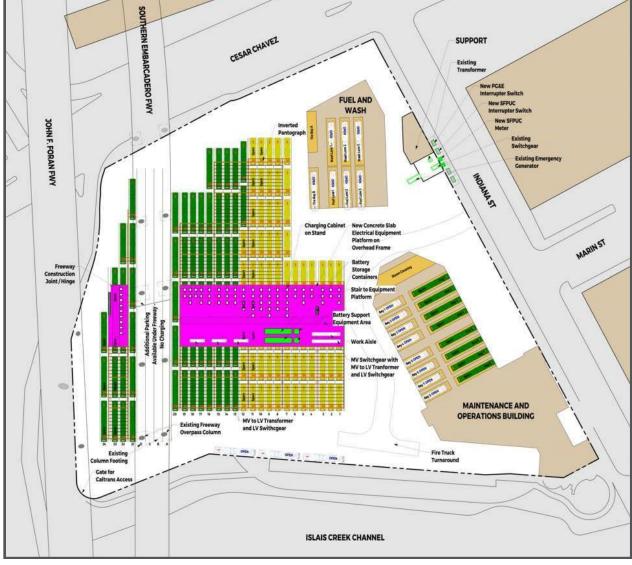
Islais Creek Yard - Full ZEB Build-Out
